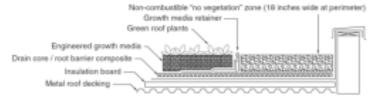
Typical Cross Section Built-in-Place Green Roof *Source:* Luckett, K. 2009.
